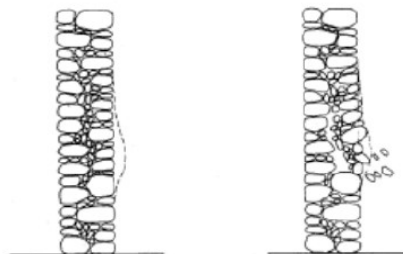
Drawing from (Mastrodicasa, 1988): a typical crushing failure of a masonry pillar.
